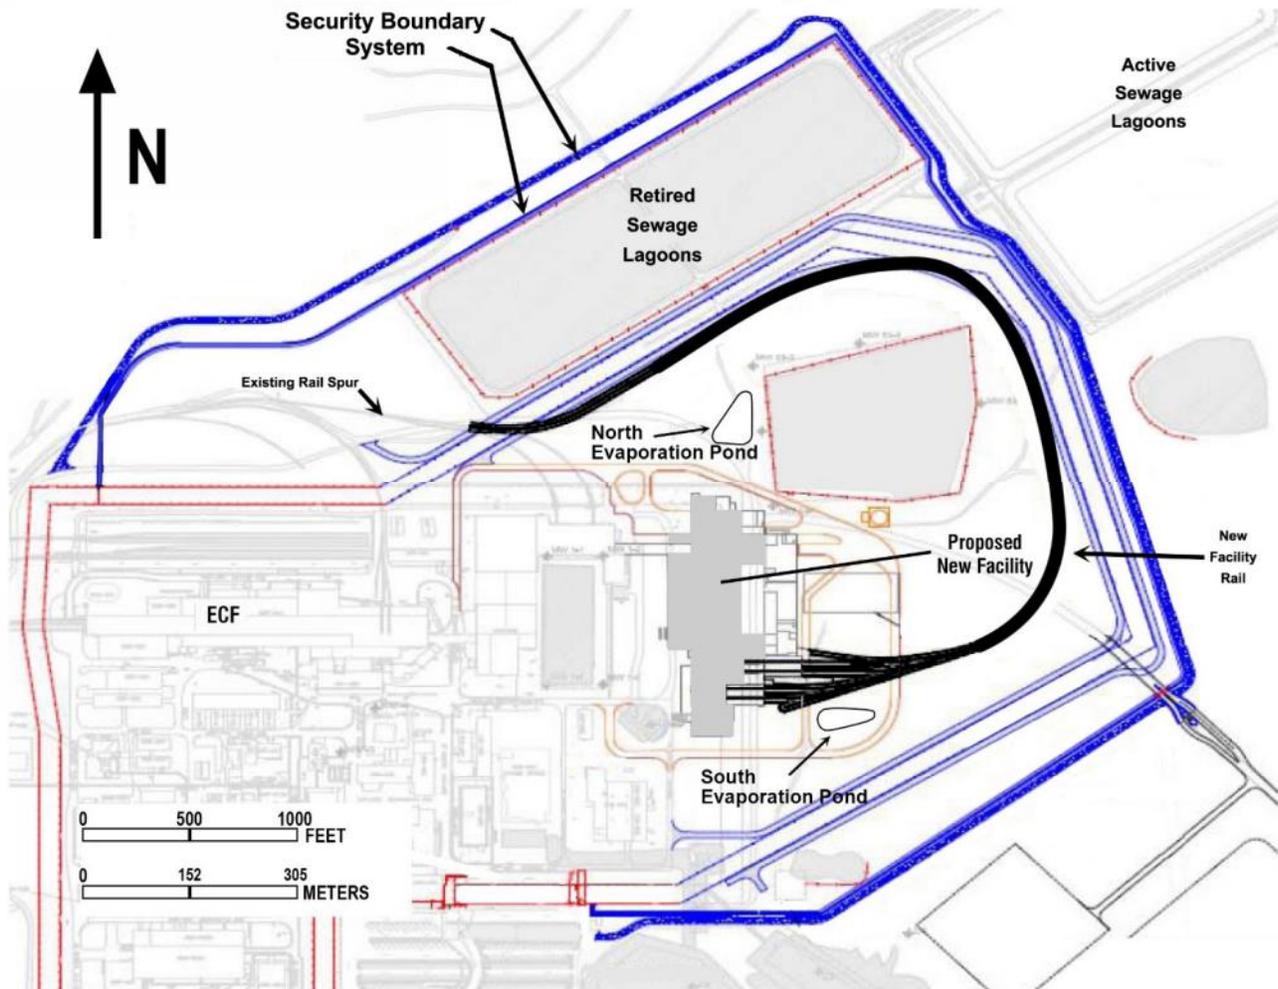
Conceptual Site Layout for Proposed New Facility at Location 3/4
